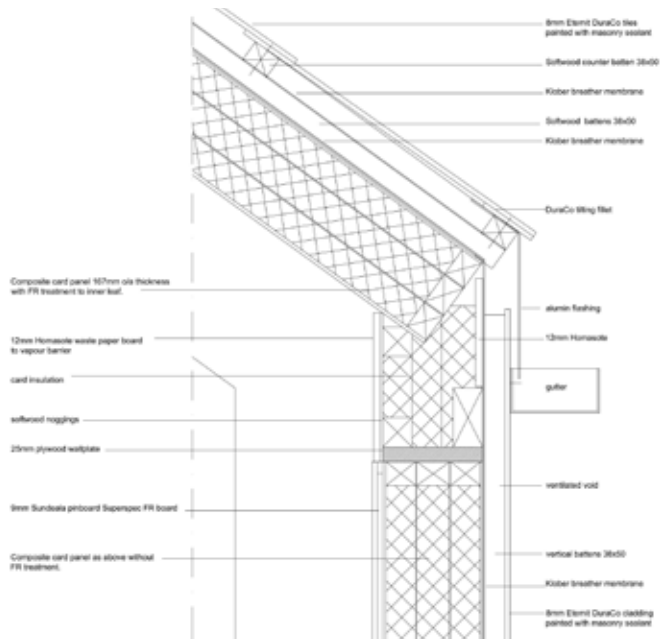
Westborough School, detail of connection between the wall and the roof panels at the eaves of the building, 2001
